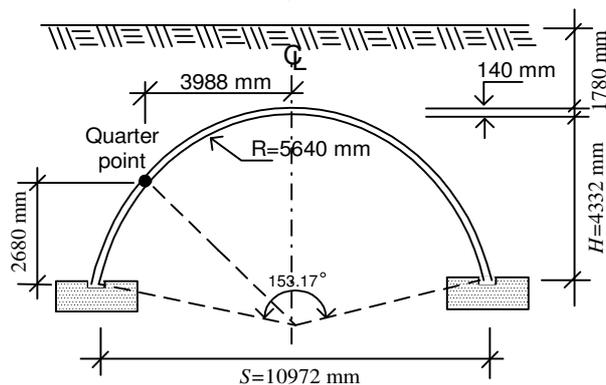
Sectional dimensions and geometry of the culvert structure (not to scale)
